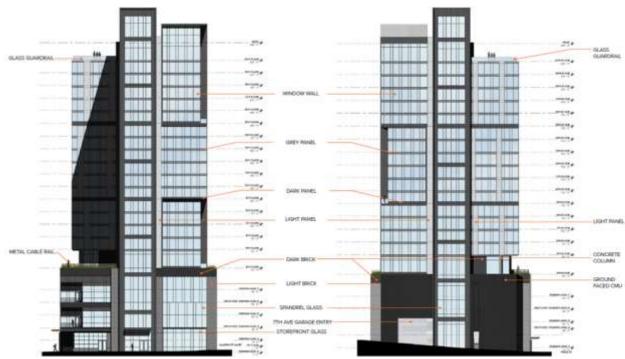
West Elevation (left) and 7th Avenue South Elevation / East Elevation (right)
